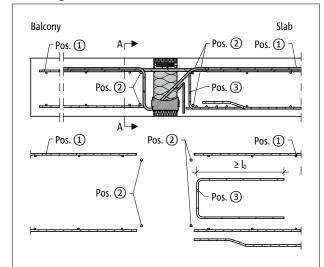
Schöck Isokorb® T type K-E, K-T: On site reinforcement; floor with edge beams
